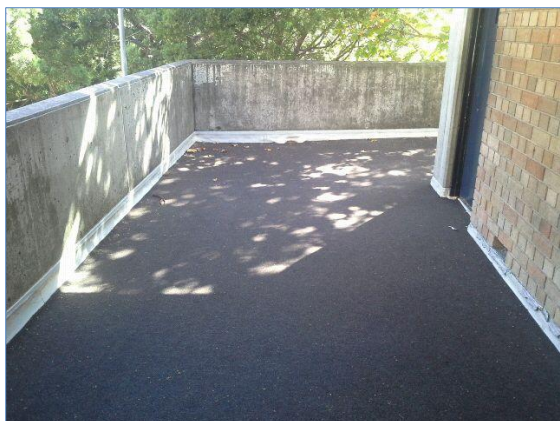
Level 3 room 3.3 balcony - Waterproofing membrane
